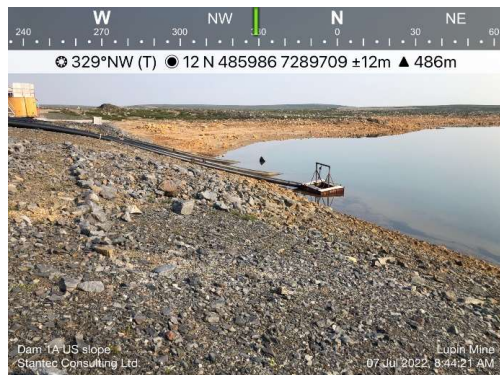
Looking northwest at the upstream slope of Dam 1A.
